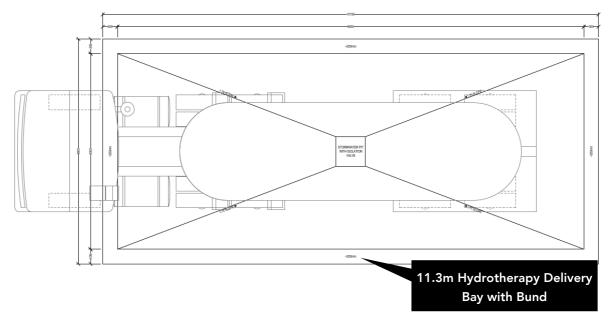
Loading Bay Arrangement with Bund (Source: CPC Commercial Pool Consulting)
